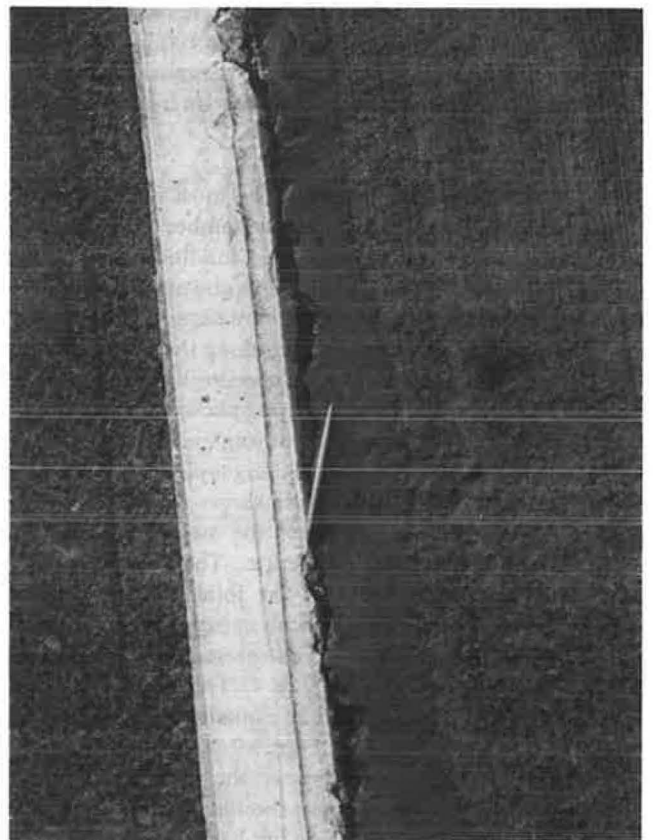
Epoxy patch and transverse crack at a joint.
